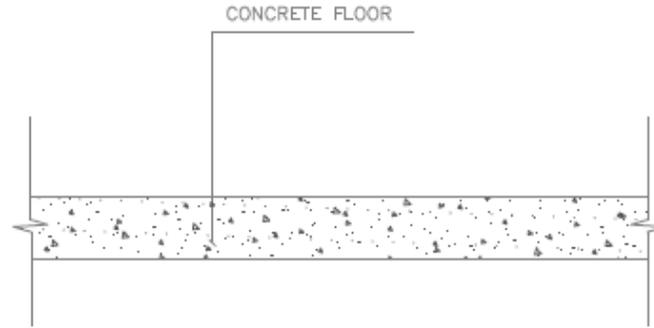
Floor details for 0.1 m concrete instead of gypsum
